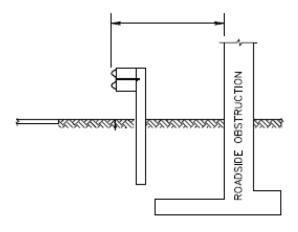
MASH W-Beam Guardrail System Deflection Distance
